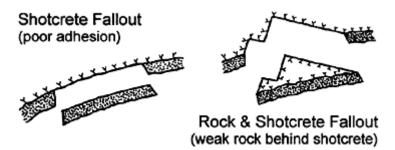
Shotcrete failure modes at Kiruna.
